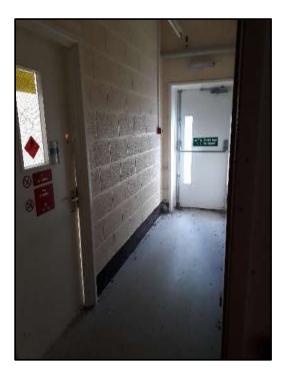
E Block, evidence of alteration with blockwork walls and creation of secondary access to the west facing elevation of spur 11
